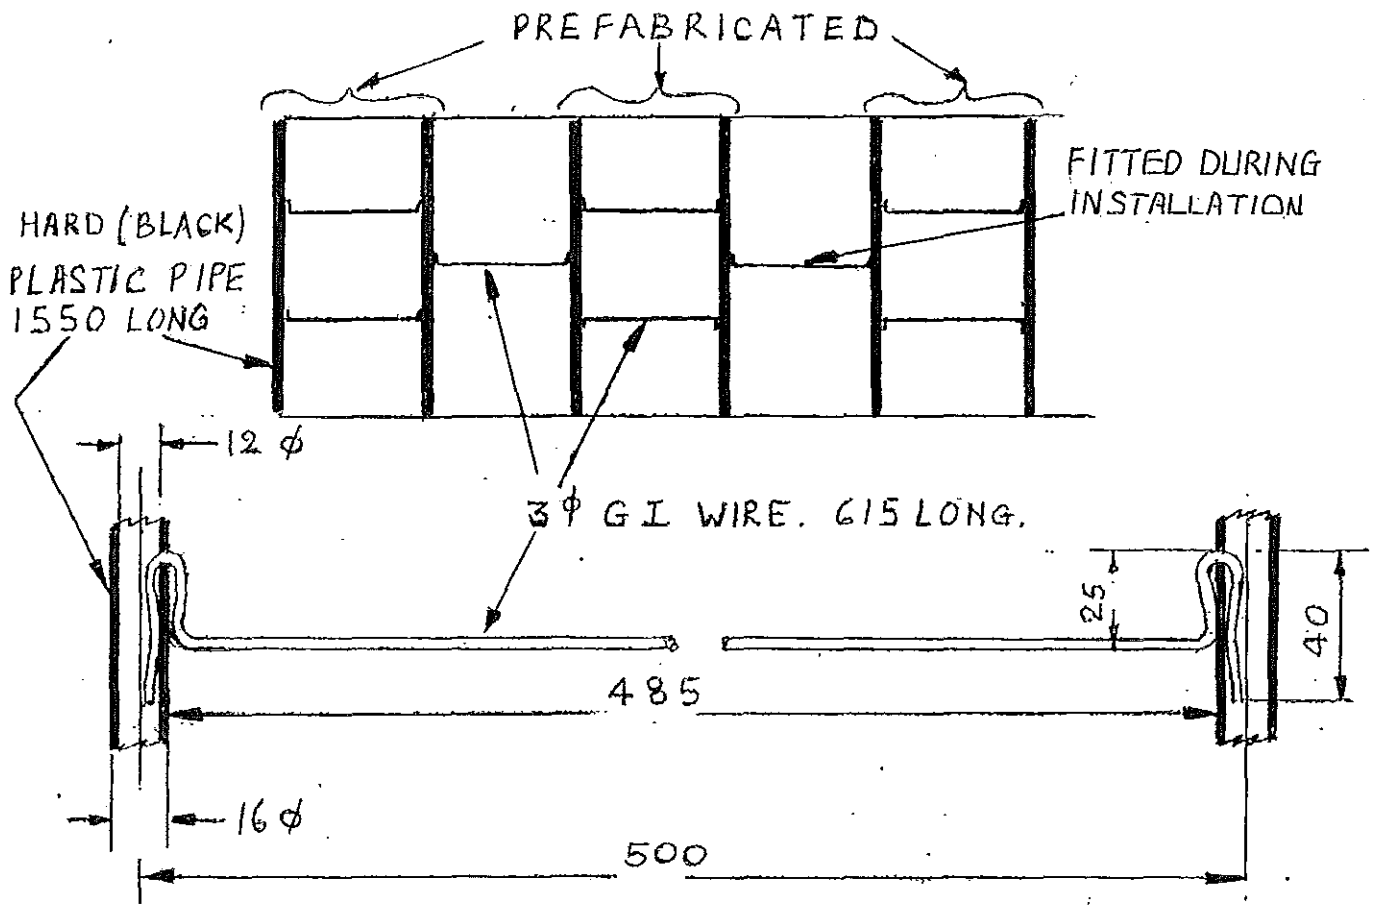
Plastic Pipe and Wire Struts to Hold Plastic Sheet in Place
